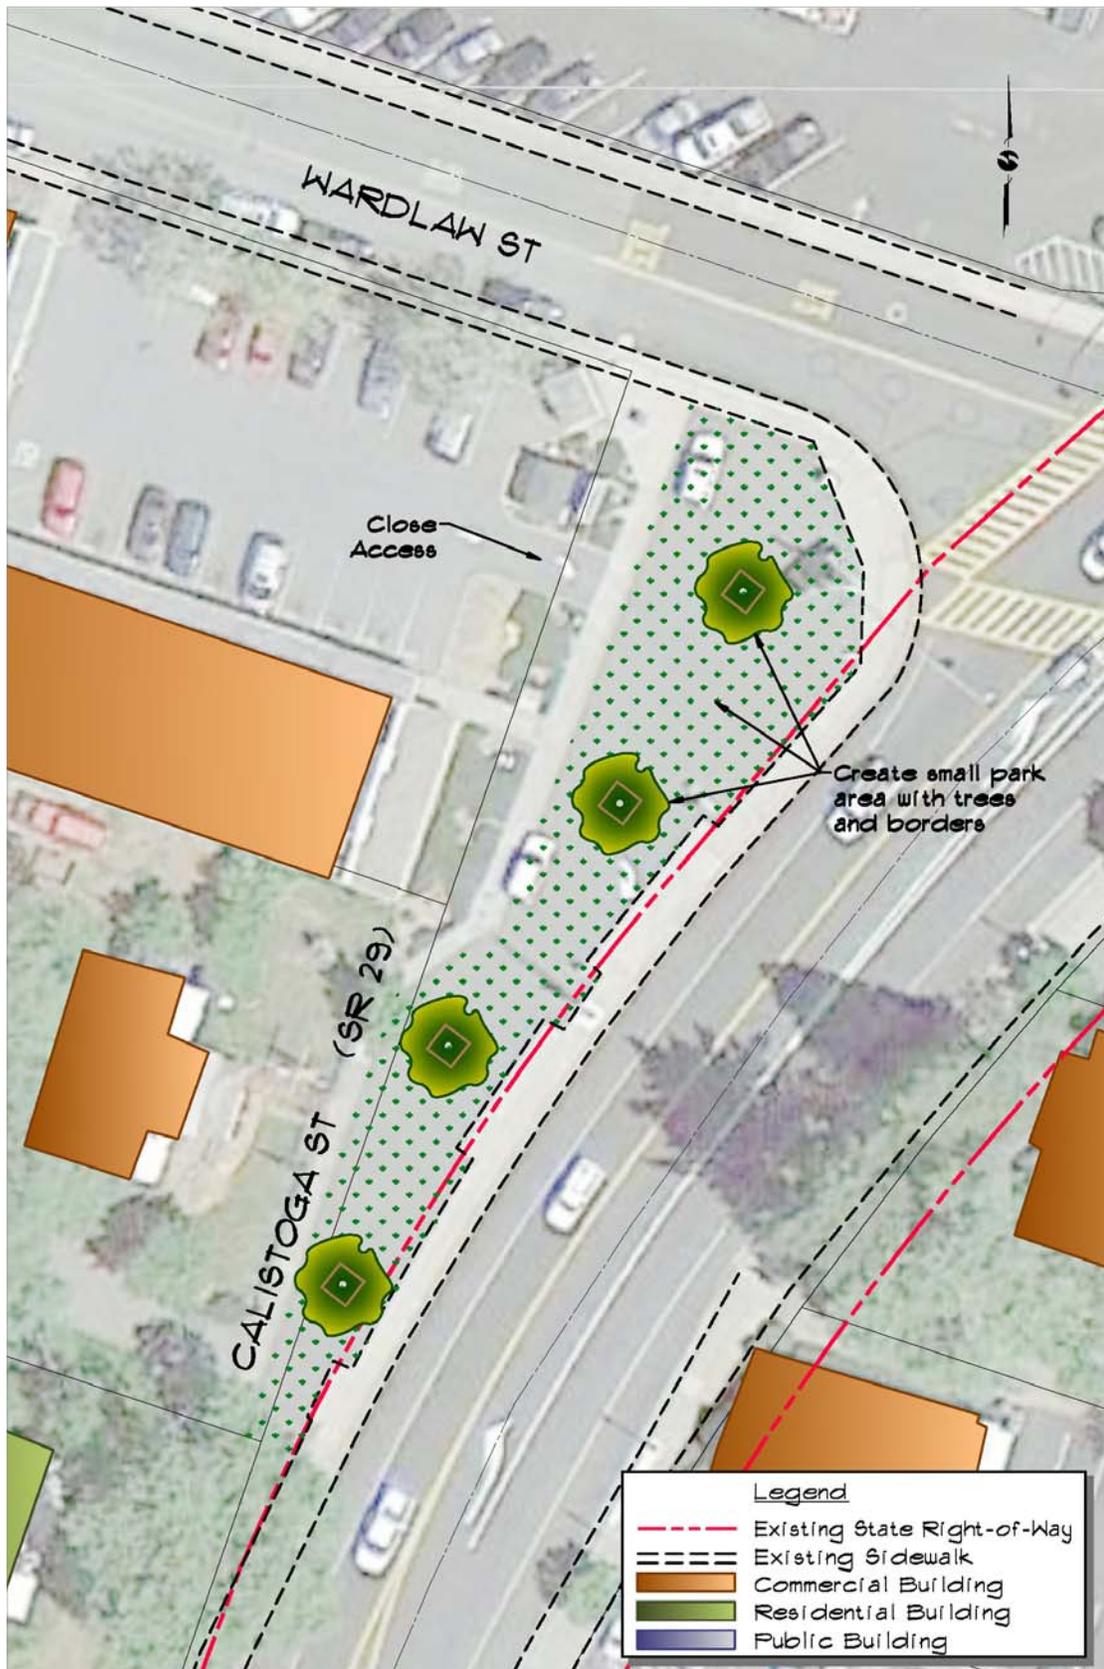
DOWNTOWN PLAN (FIGURE INDEX)
